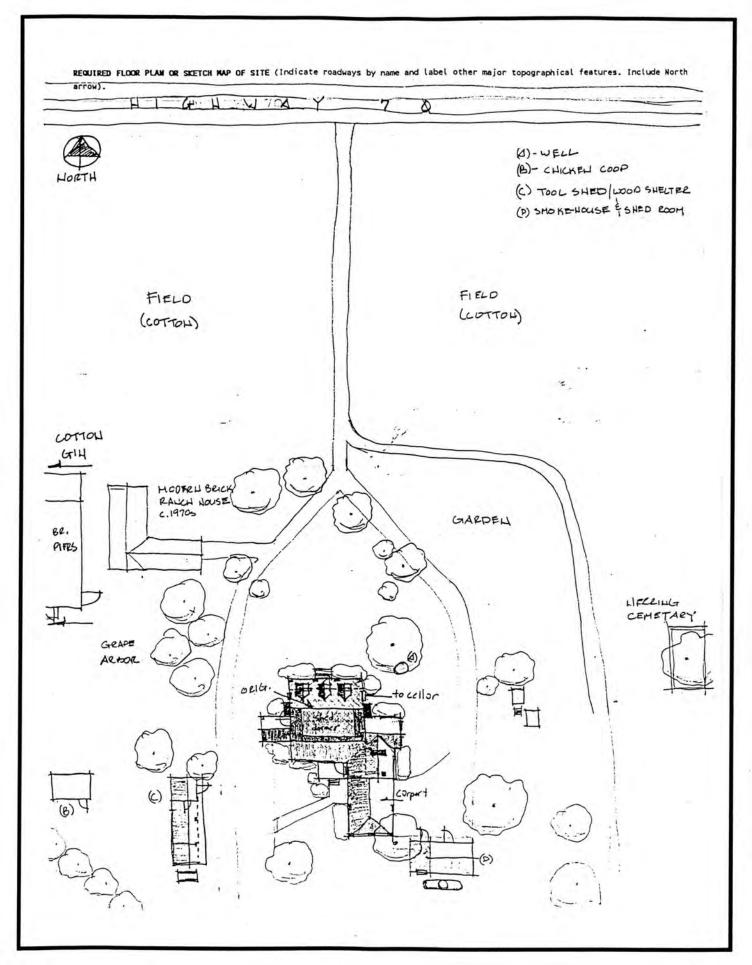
Henry L. Herring House (#15) - site plan, northern section, drawn by Robbie D. Jones in 1973
